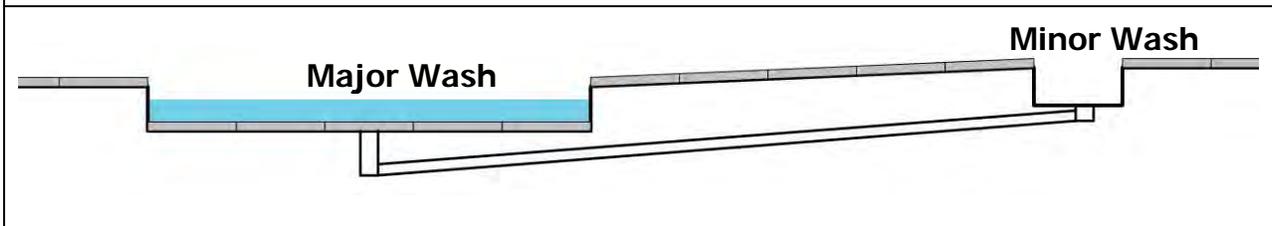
Scenario 35: Plan View of the Test Model – Elevation
